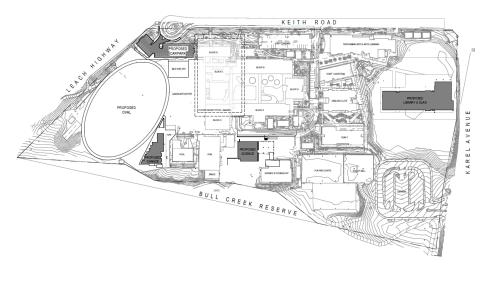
Excerpt from Proposed Site Plan – Overall, Dwg No. A0.101, Rev. A. (Bateman Architects, 2022).
